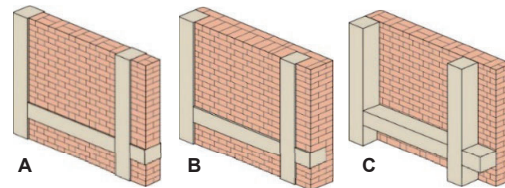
Wall type of existing TFBC buildings in Japan [1]
